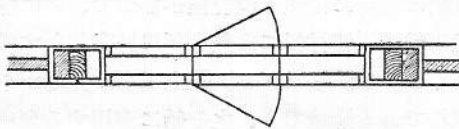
Section of Wall of Sound-proof Hut constructed on the Isolated Strata Principle.
